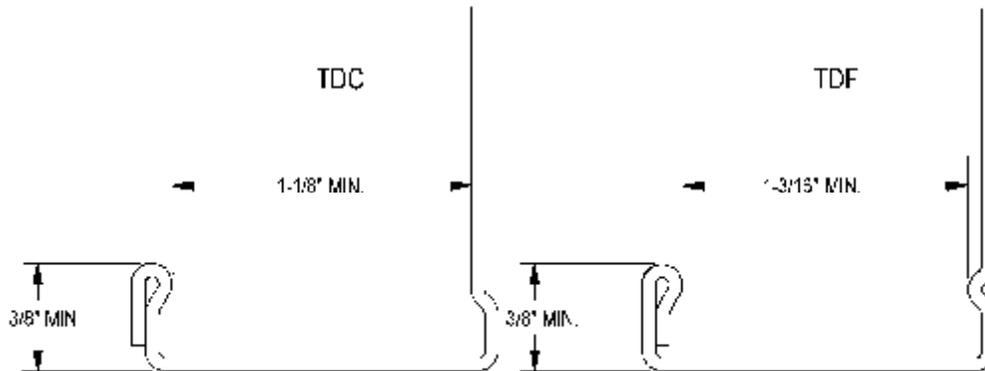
TDC and TDF Duct Flanges Dimension Requirements
